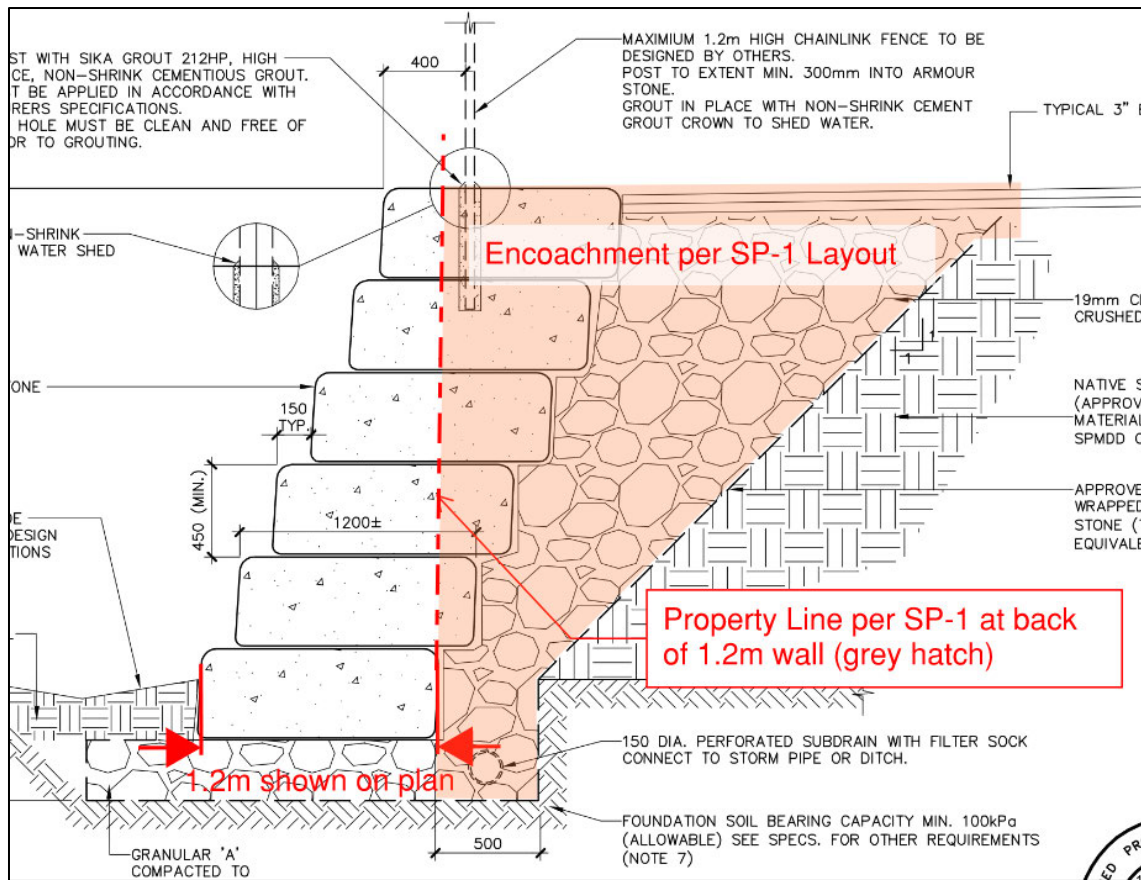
SK-2 by LMS encroachment per SP-1 wall layout
